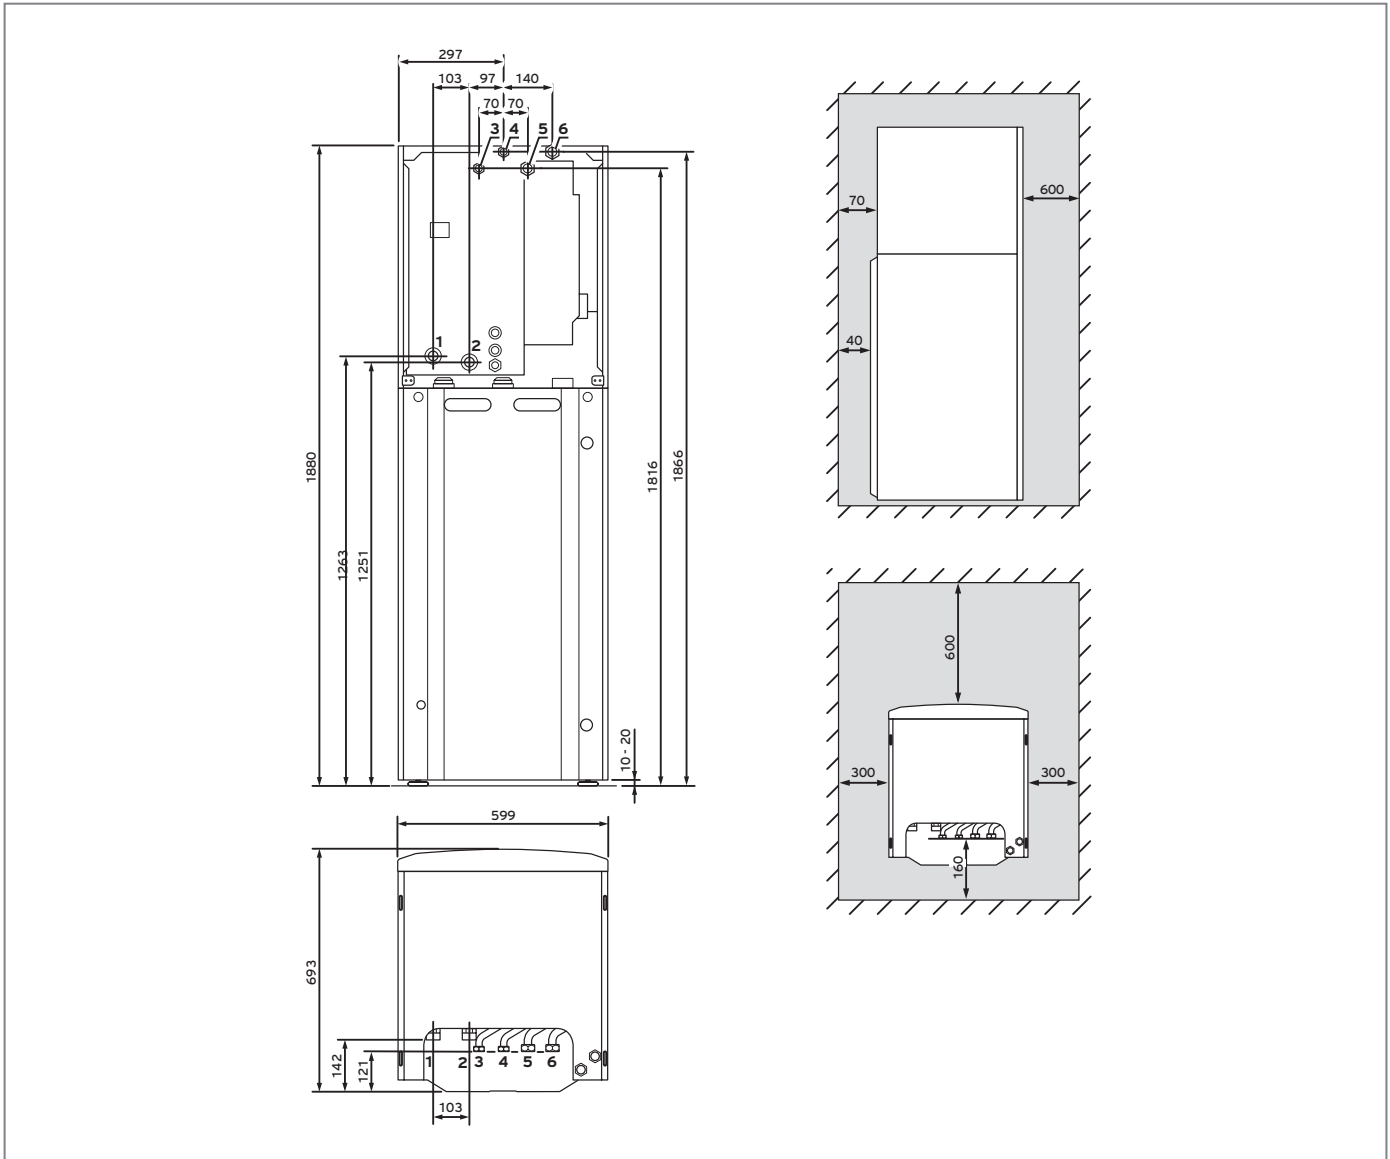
uniTOWER VIH QW 190/1 E dimension drawing and connection dimensions
